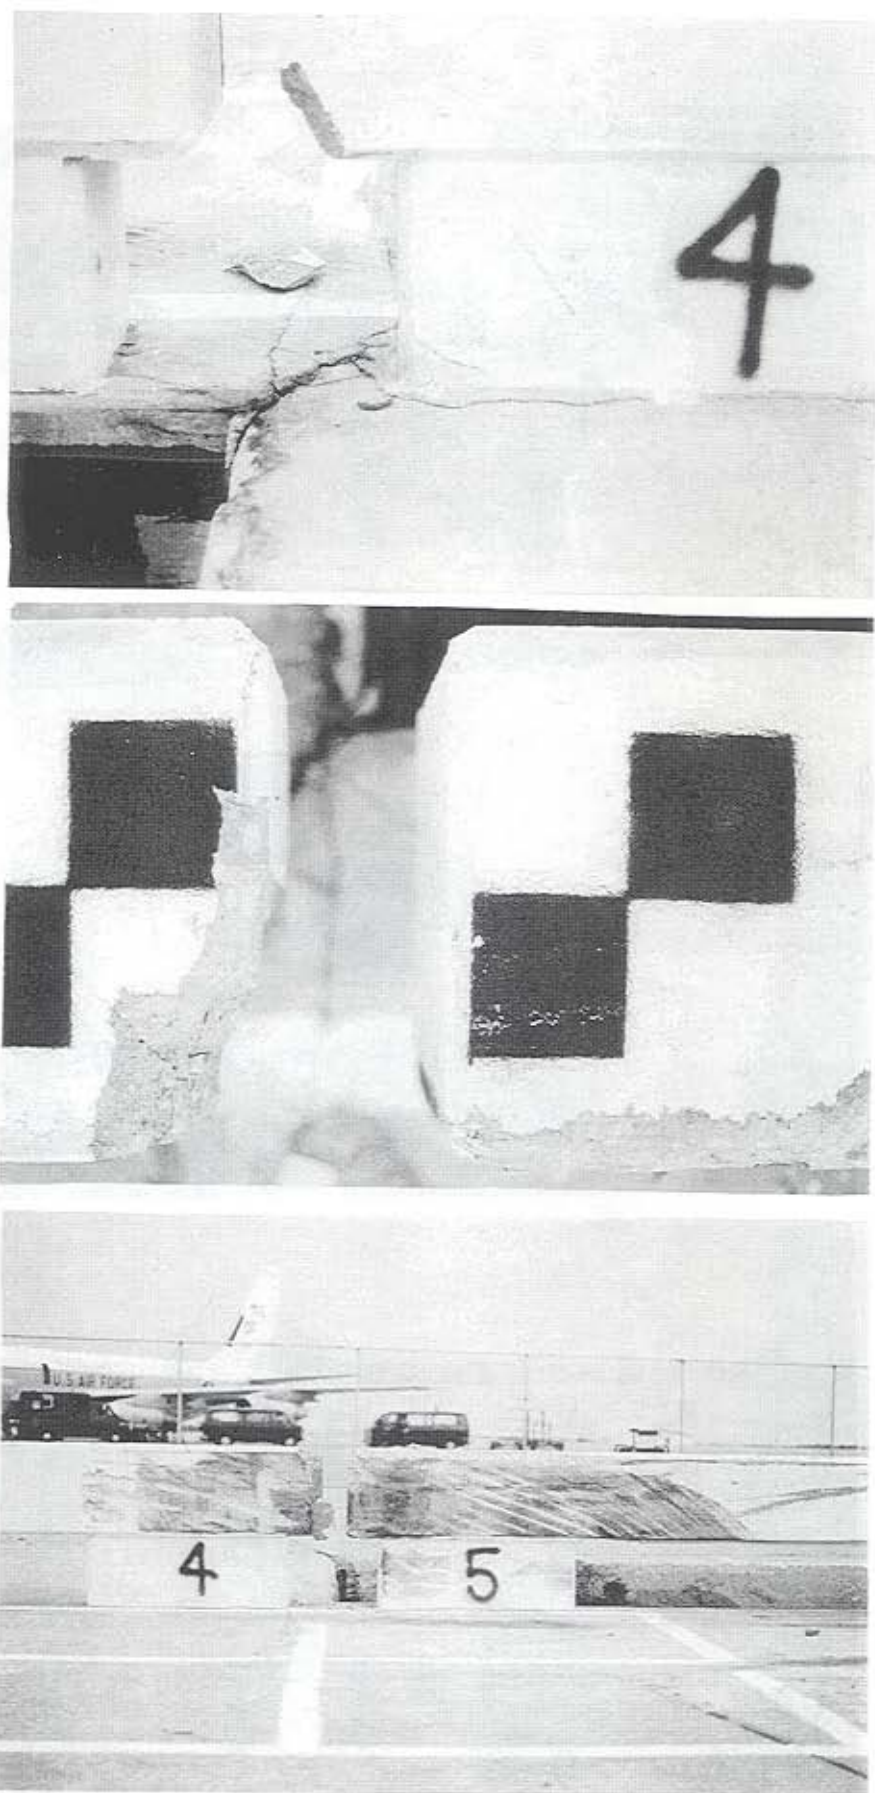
Bridge Rail Damage at the 11.4-cm (4 ½-in.) Expansion Gap, Test NEOCR-3
